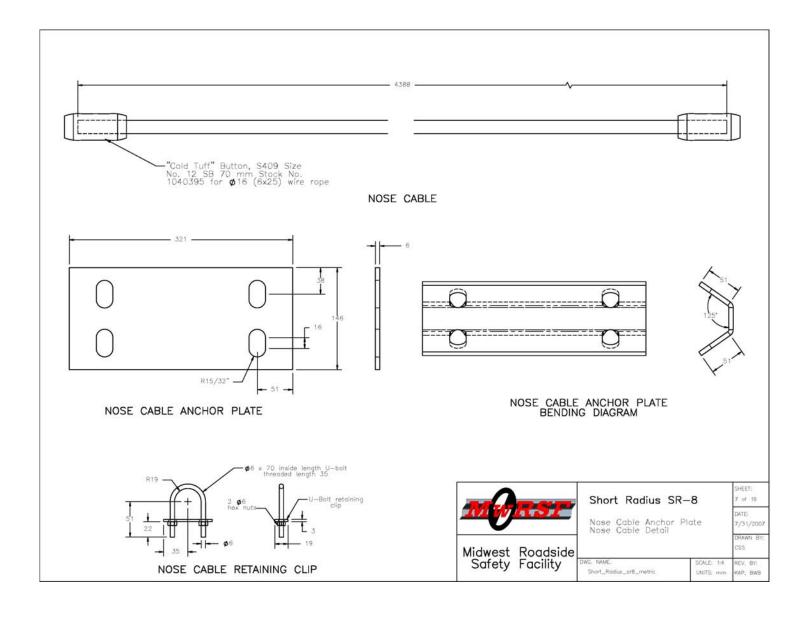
Nose Cable Anchor Plate and Nose Cable Detail
